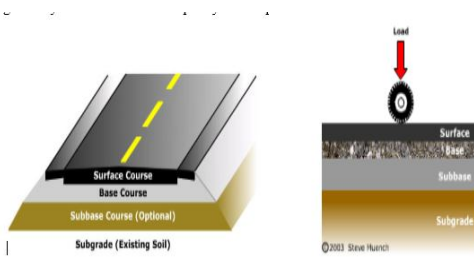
shows a typical cross section and the layer compositions of a flexible pavement.
